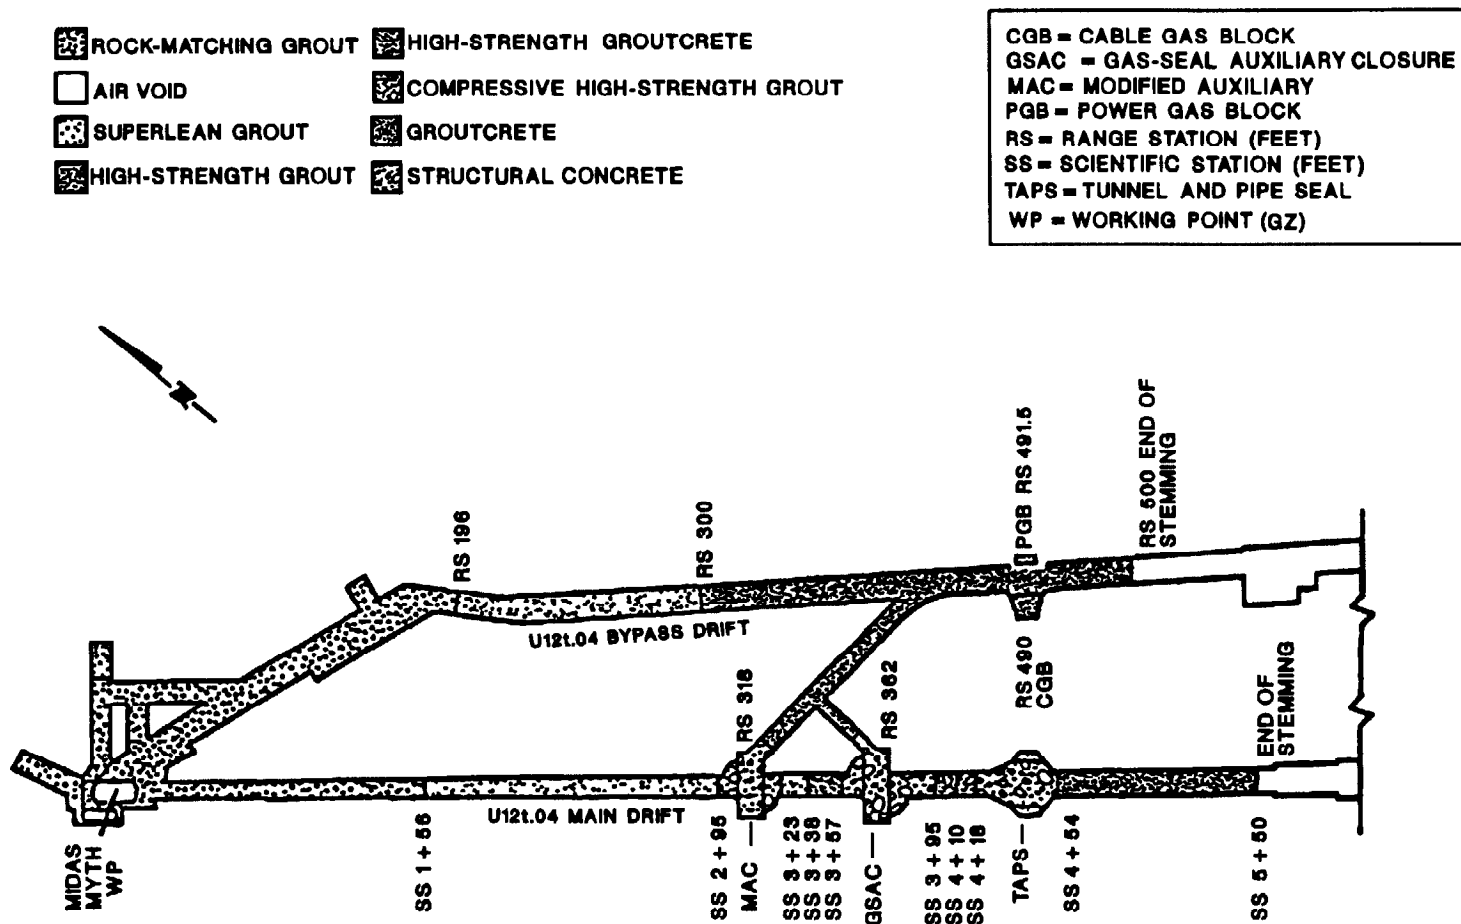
MIDAS MYTH/MILAGRO event - tunnel and pipe layout.
